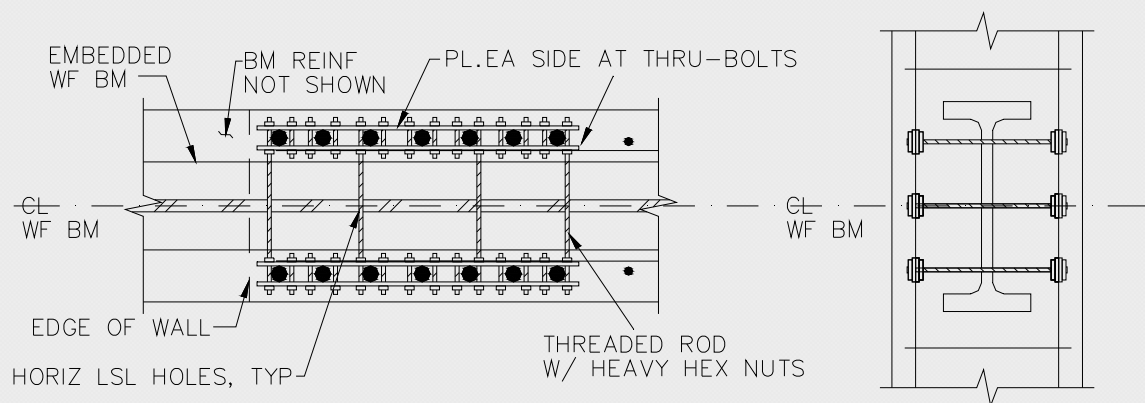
Threaded Rods and Side Plates at Embedded Steel Section Providing Improved Restraint Against Bar Buckling
